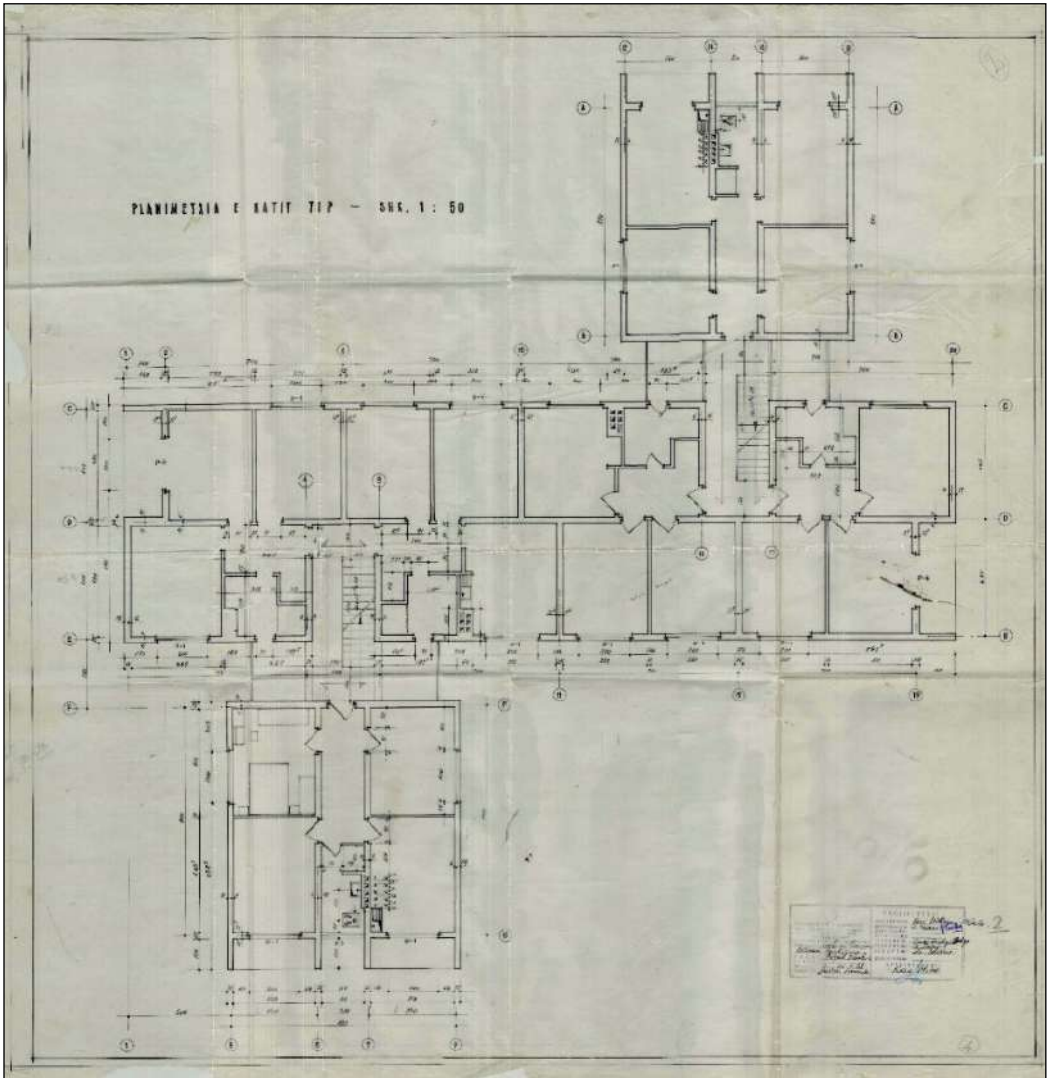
Original normal floor plan of apartment block Type 1 (Source: AQTN)
